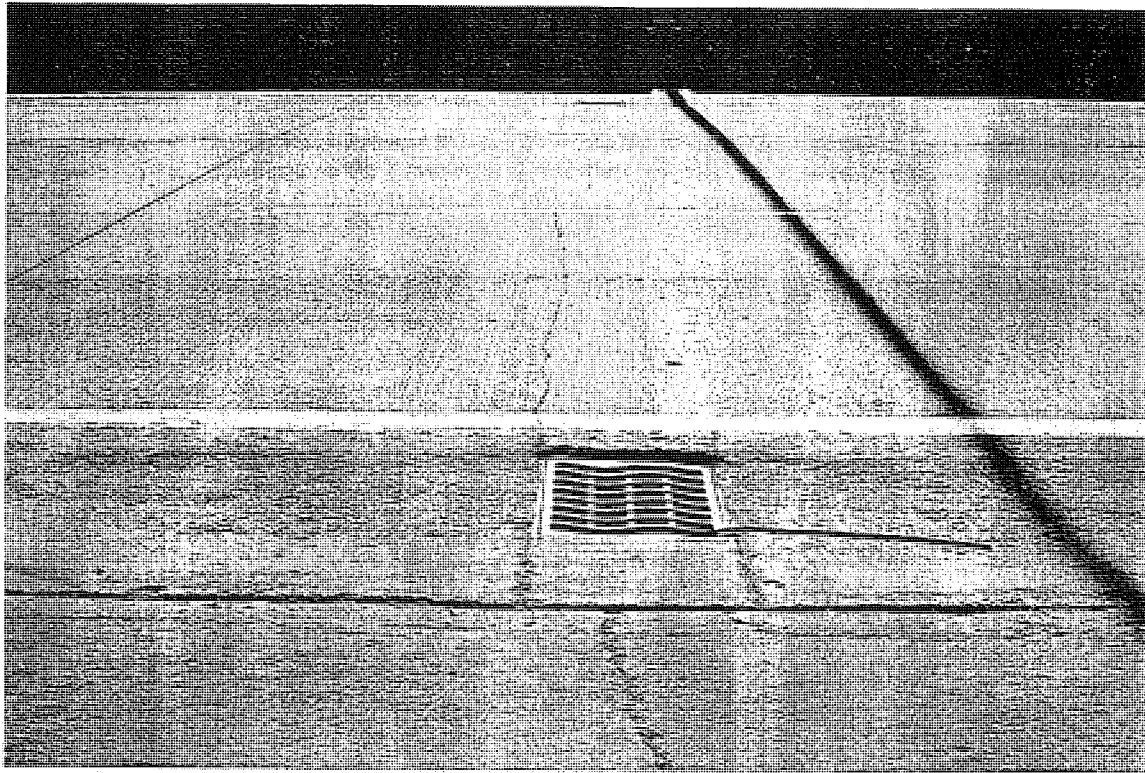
A drainage structure that has induced a full width transverse crack on CSN# 25132-06582A SB.
